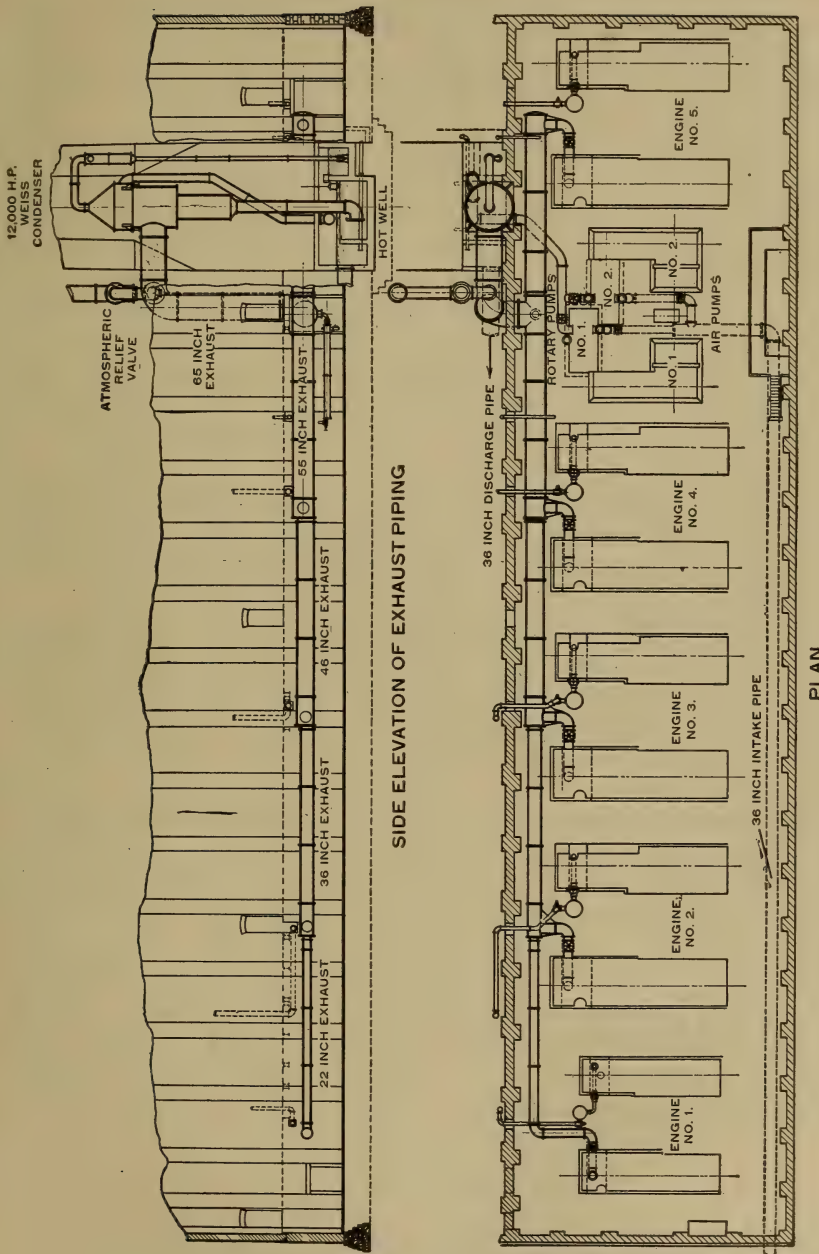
Condenser and Exhaust Steam Piping at the Northwestern Elevated R.R. Power House, Chicago, Ill.
